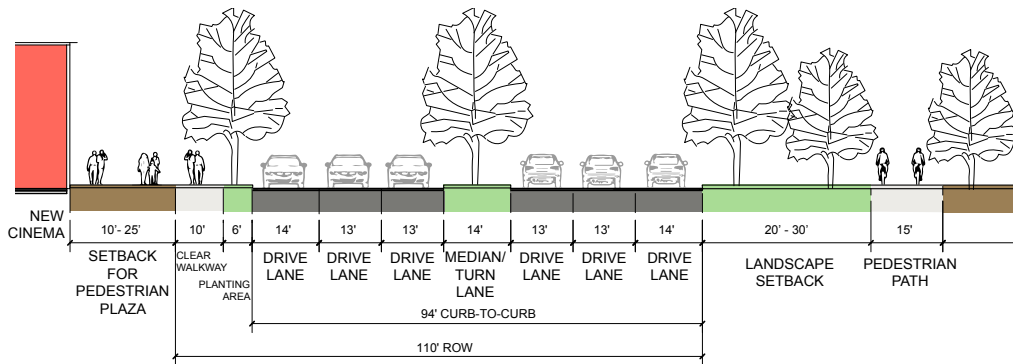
POSSIBLE URBAN BOULEVARD STREET SECTION FOR EXPOSITION DRIVE/MAIN STREET
